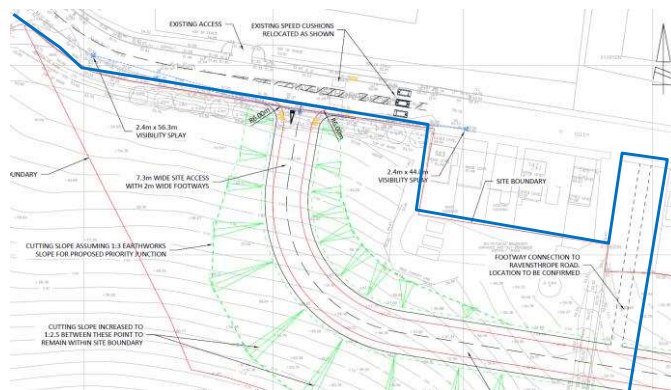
OPP detailed access layout with Site outlined in blue.
